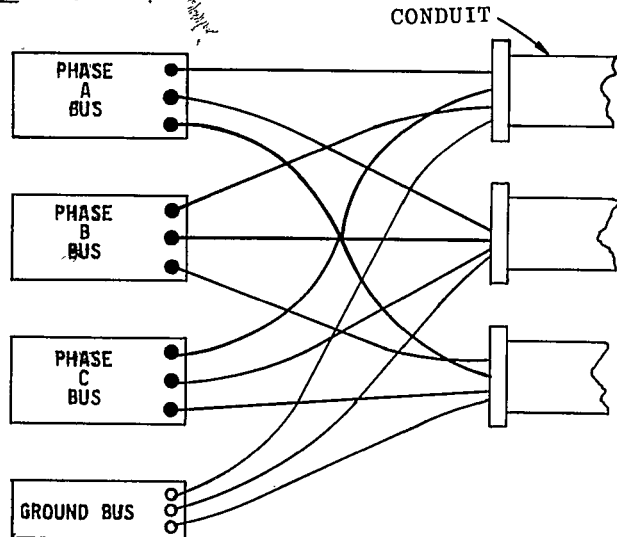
TYPICAL CONDUIT ARRANGEMENT FOR MULTIPLE SERVICE CONDUCTORS (PAR. 8.21)
